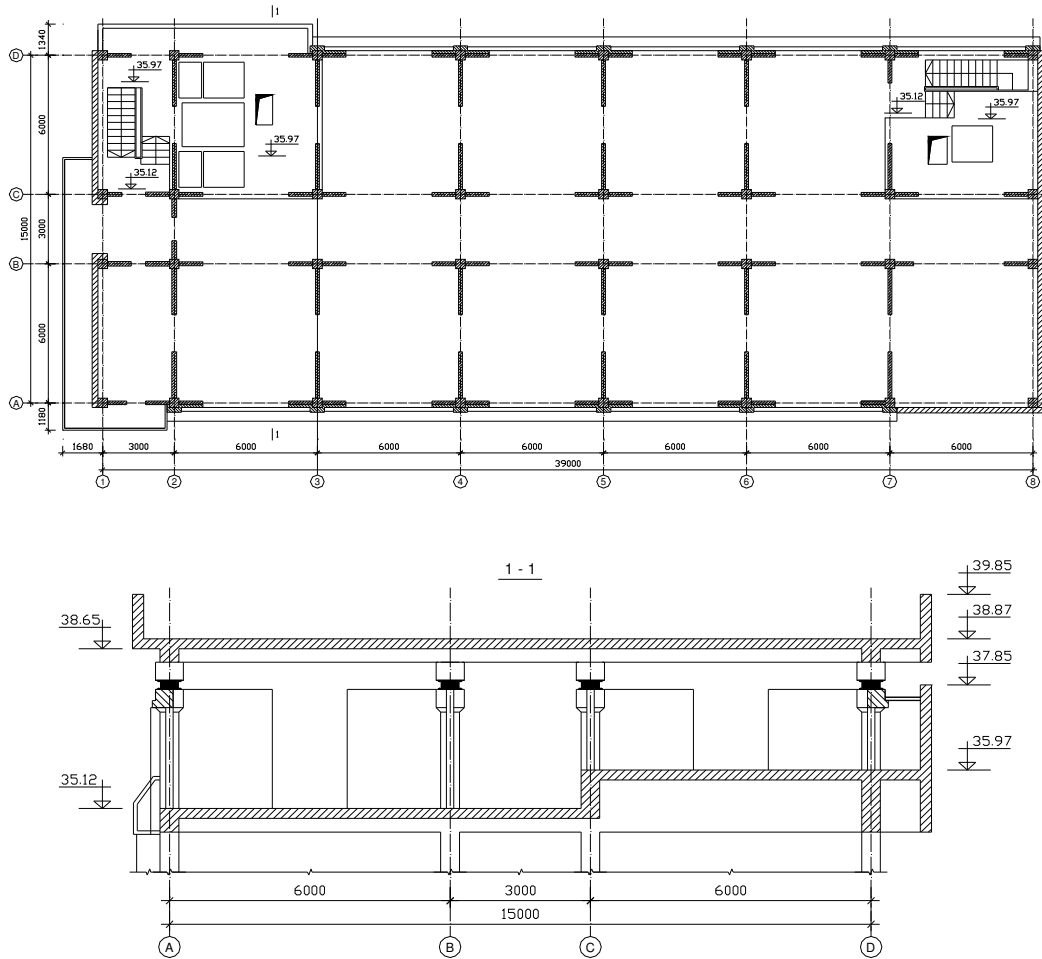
Plan and vertical elevation of the 12<sup>th</sup> floor with indication of the new R/C short walls to be constructed around the existing columns
